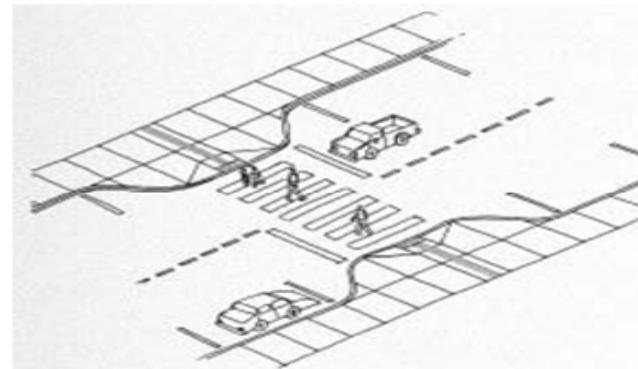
Nodes with crosswalks that define parallel parking and allow for extension of the sidewalk
